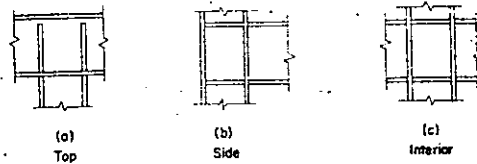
TYPES OF BEAM-TO-COLUMN CONNECTIONS
